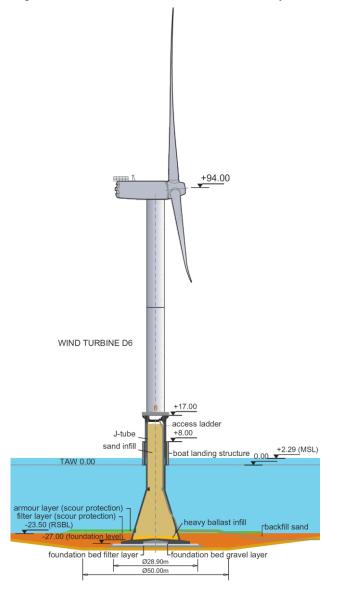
Thornton Bank Gravity Base offshore wind turbine foundations, after Piere et al. (2009).
